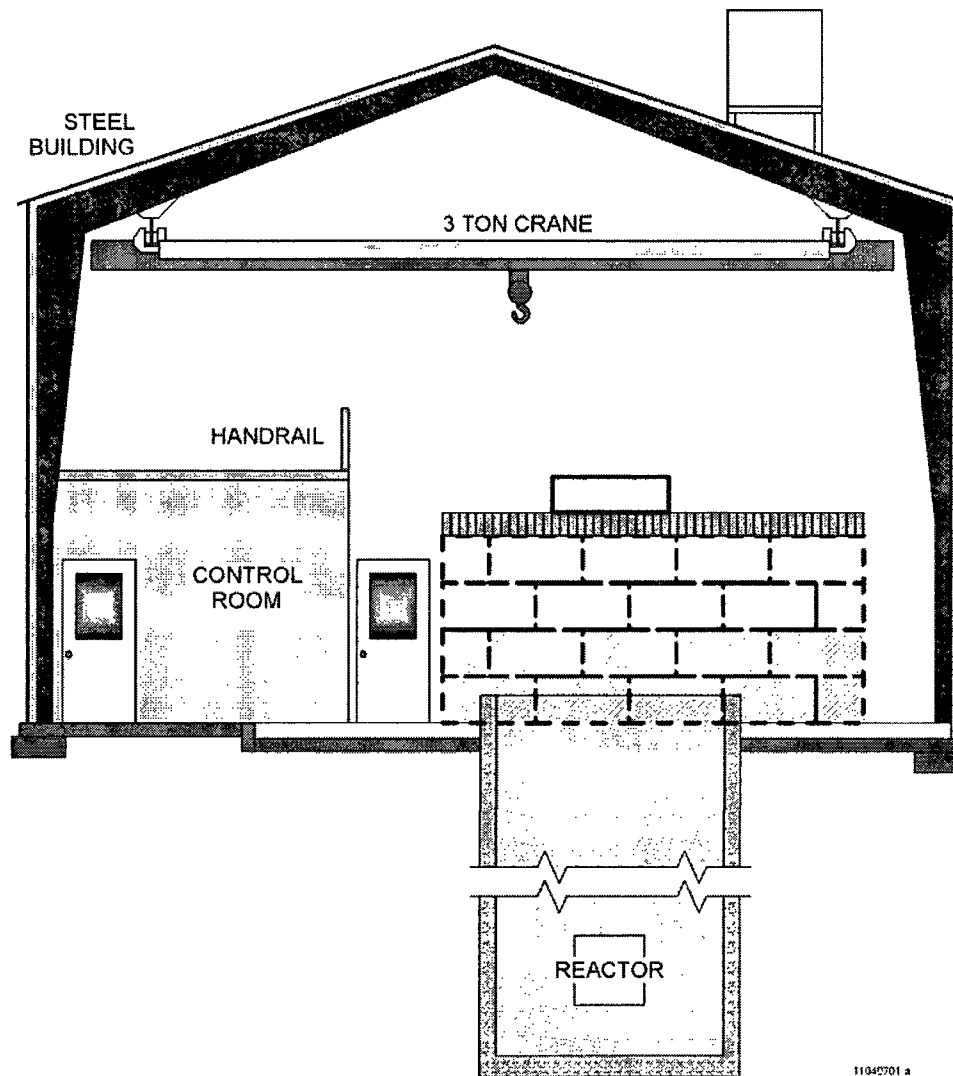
Cross Section of ARRR High Bay Reactor Building
